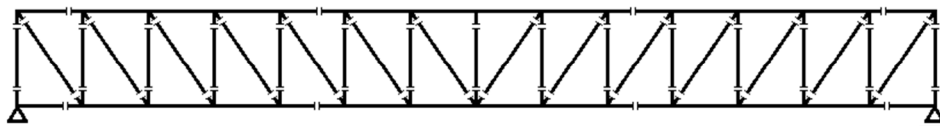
Schema of the side wall truss of the selected span of the conveyor
